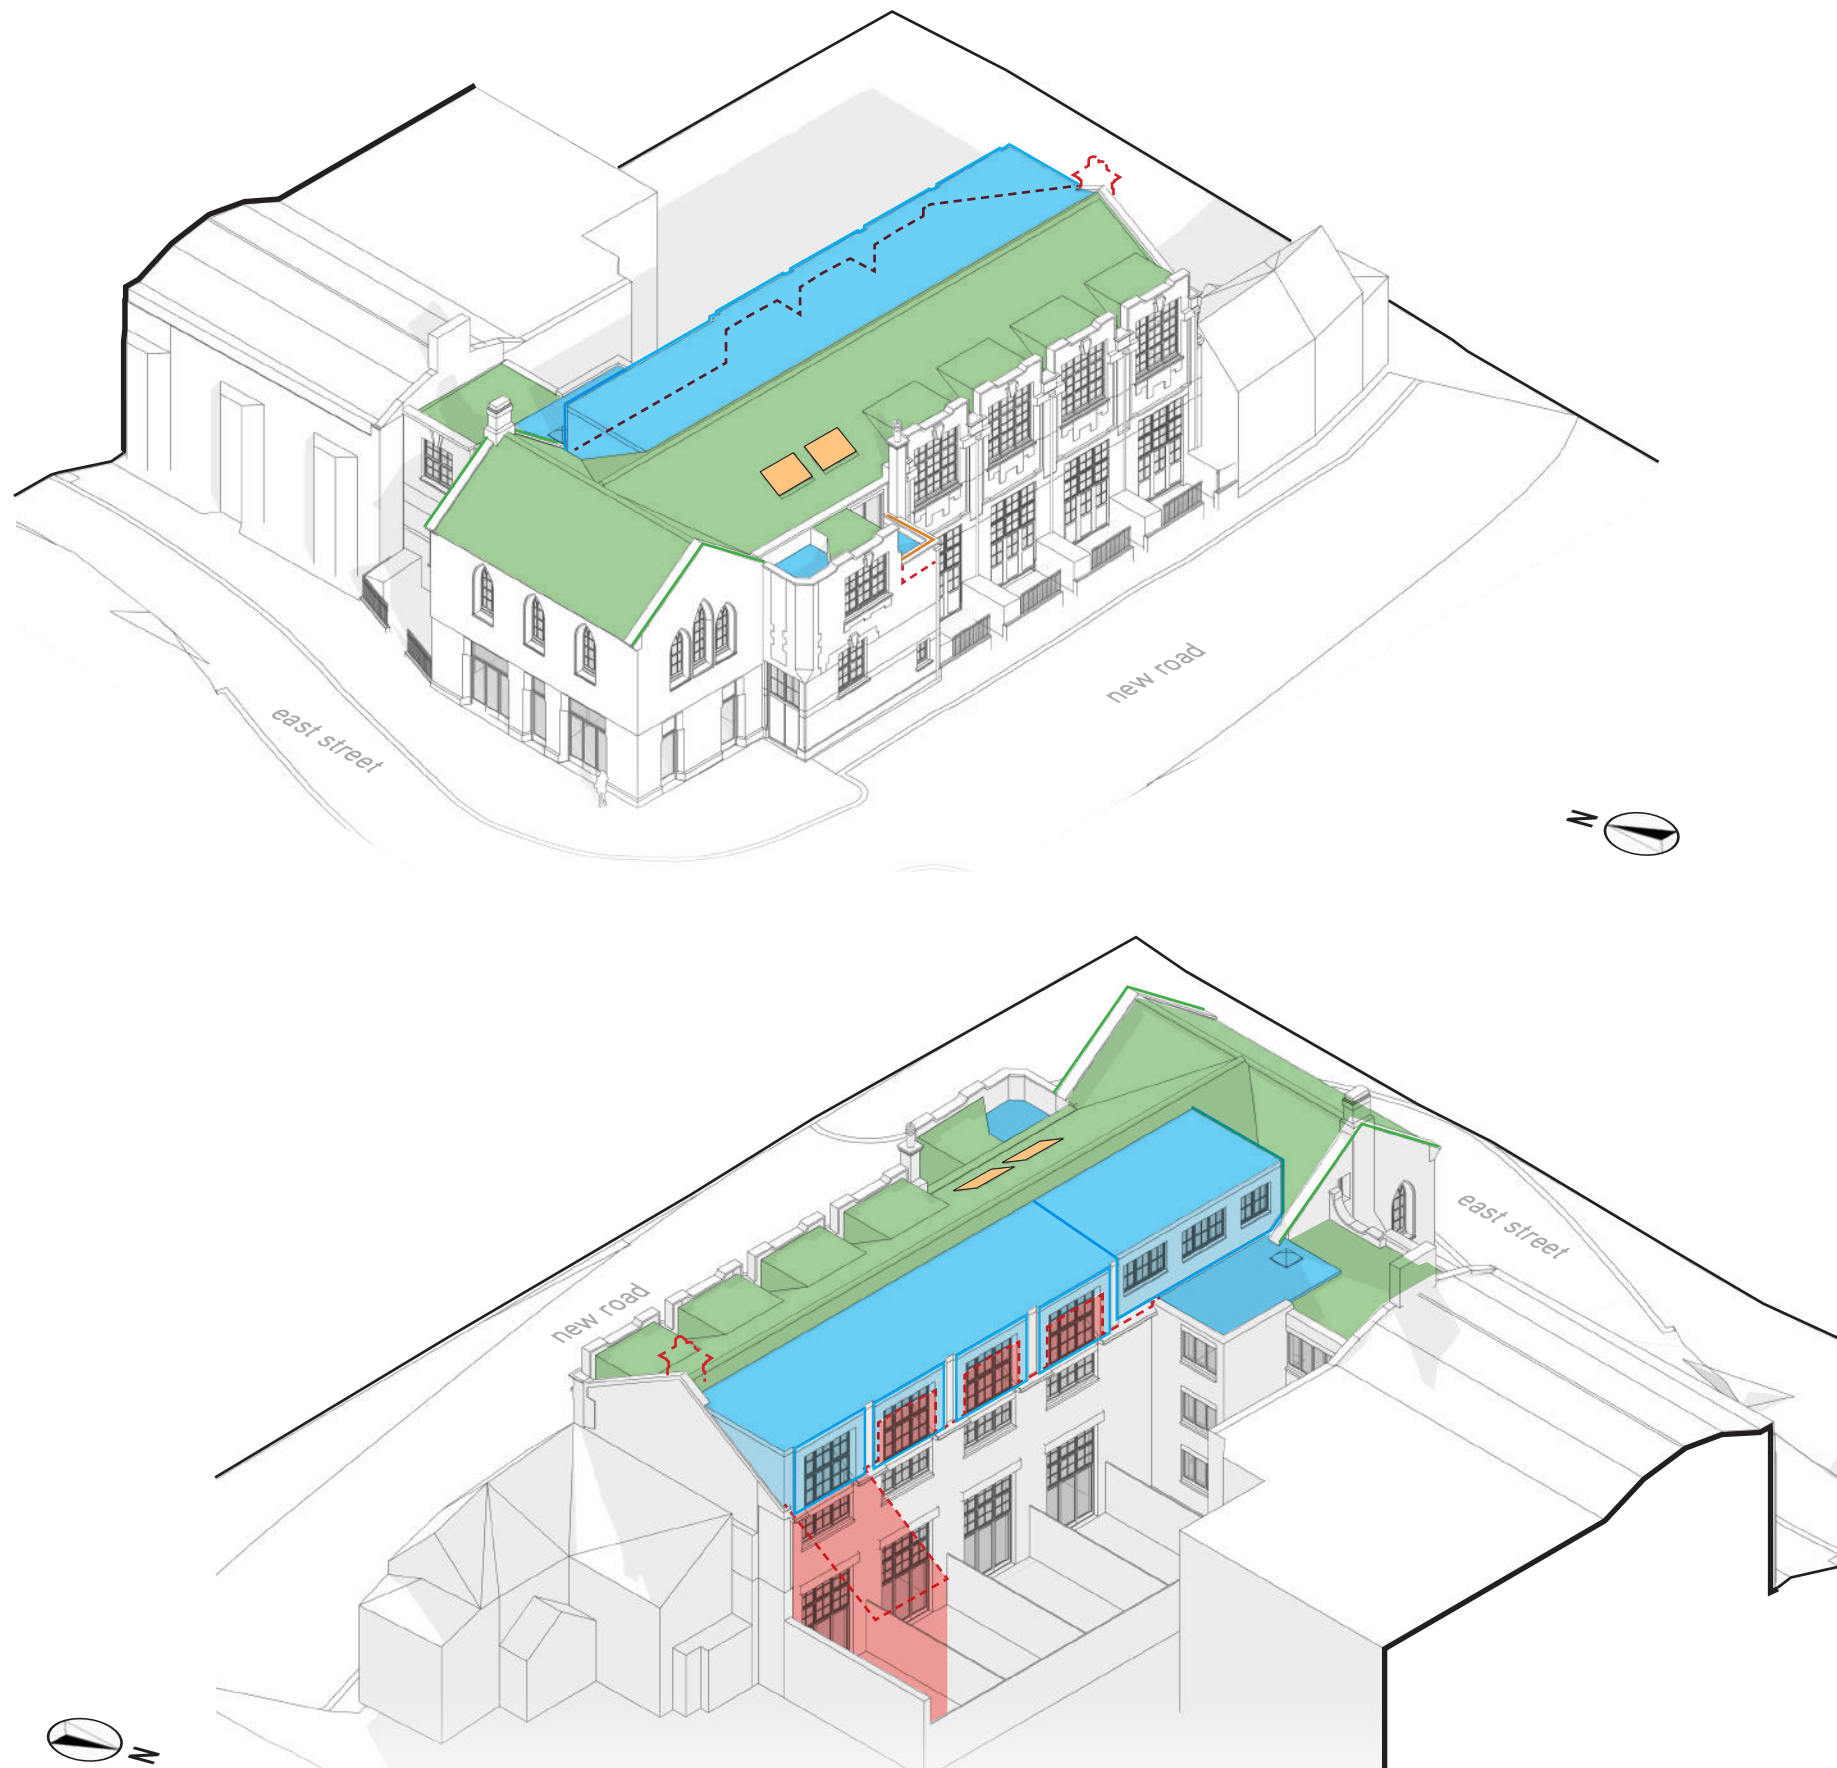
Isometric drawing illustrating proposed roof alterations.
